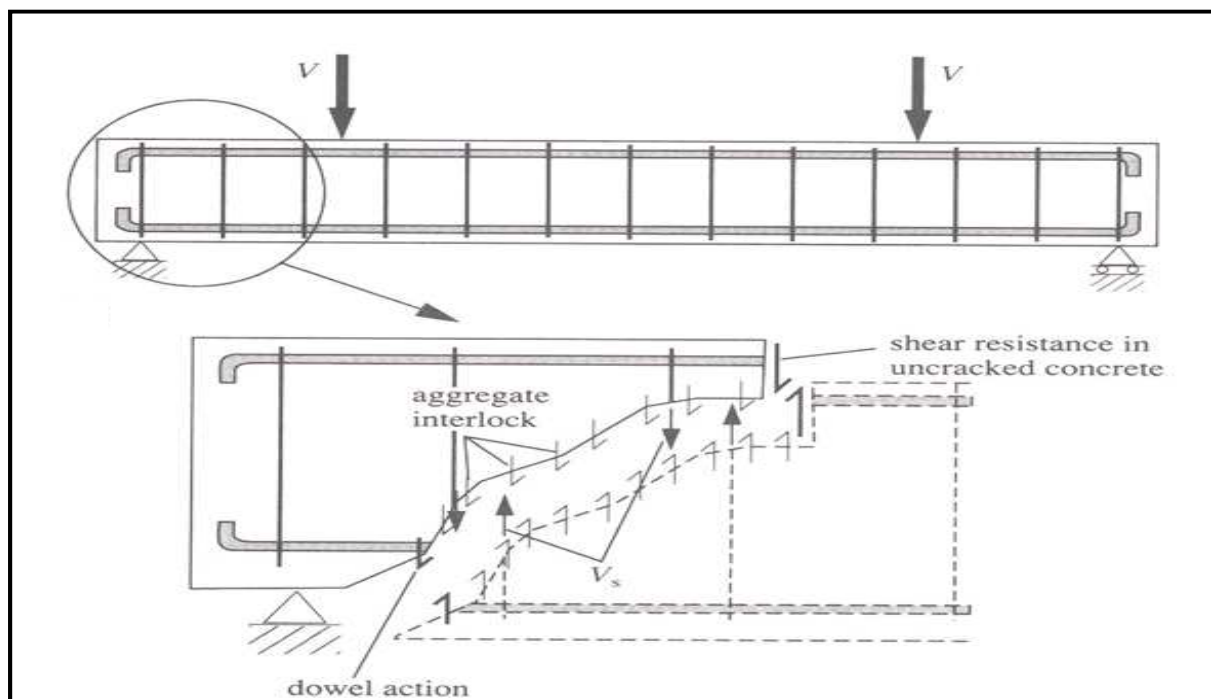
Shear resistance of member with stirrups. Elevation showing reinforcement (*top*) and transfer of shear force through the member (*bottom*). (O'Brien & Dixon, 1995)
